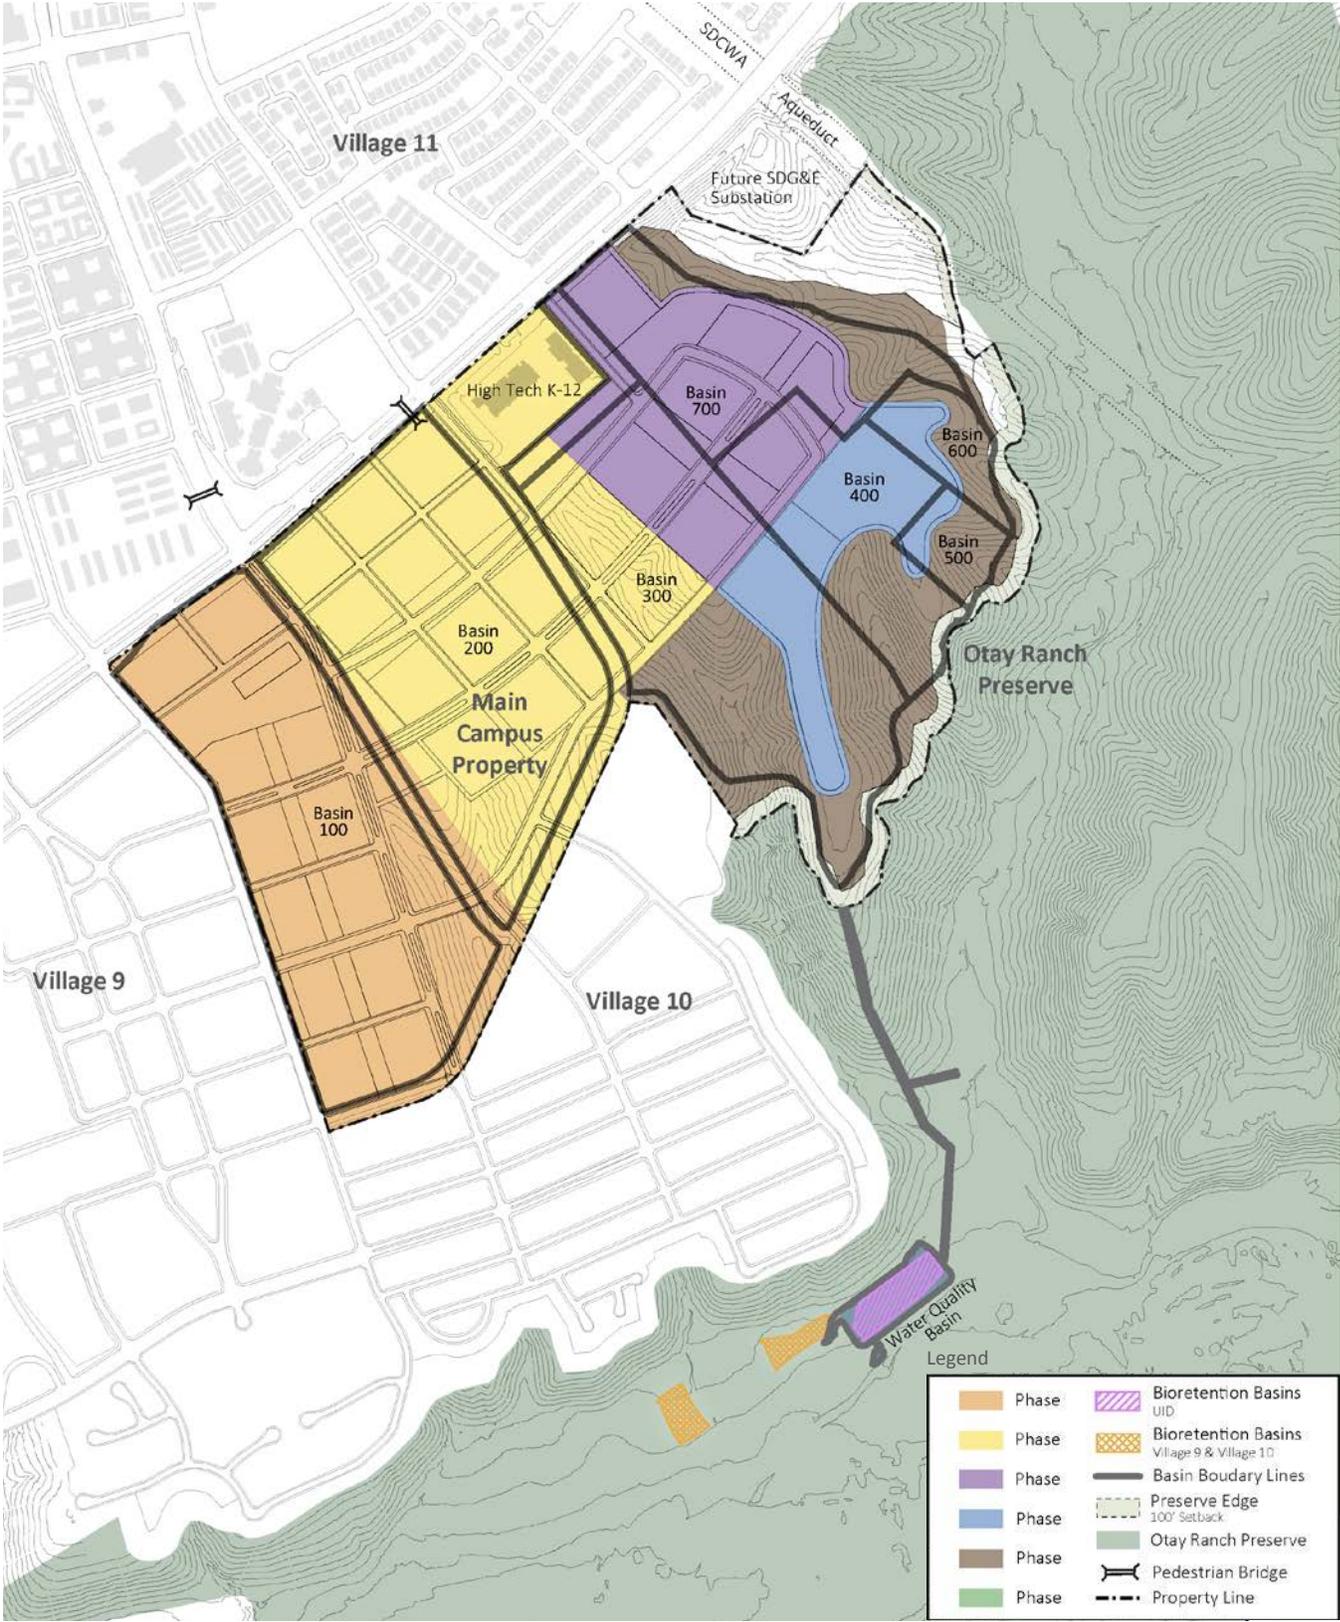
F: CONCEPTUAL MAIN CAMPUS PROPERTY DRAINAGE PLAN
